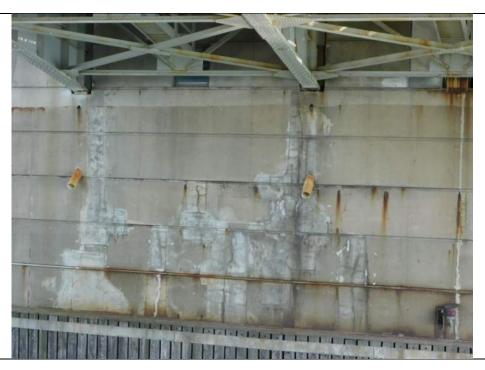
[Pier 4] -Detail view of repairs and cracking across east half of north face, Looking South
